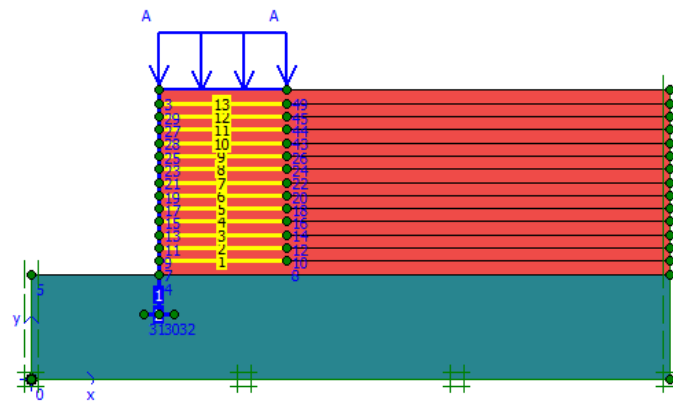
Reinforced Earth Retaining Wall with Dense Sand used as a Backfill Material
